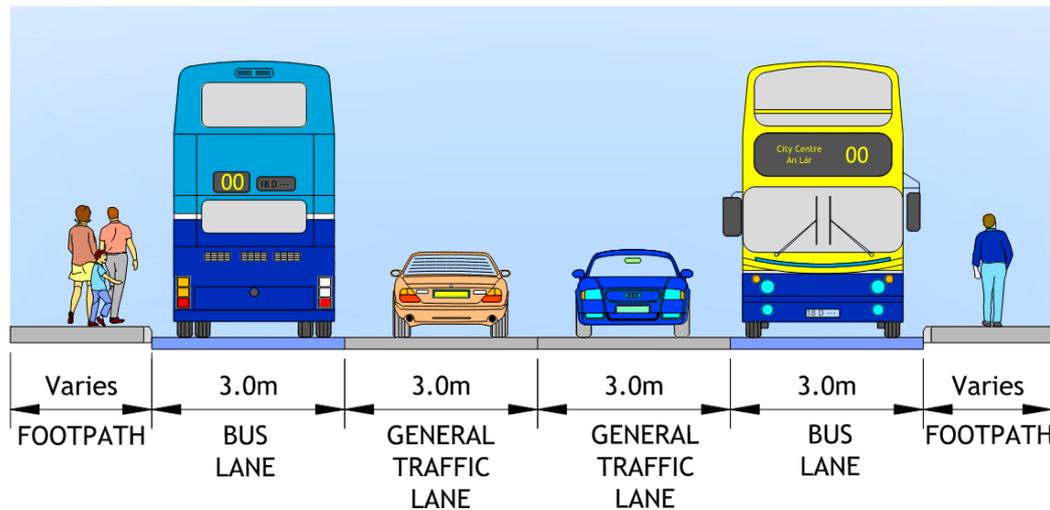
Cross-Section C-C (Relevant to RF2)
